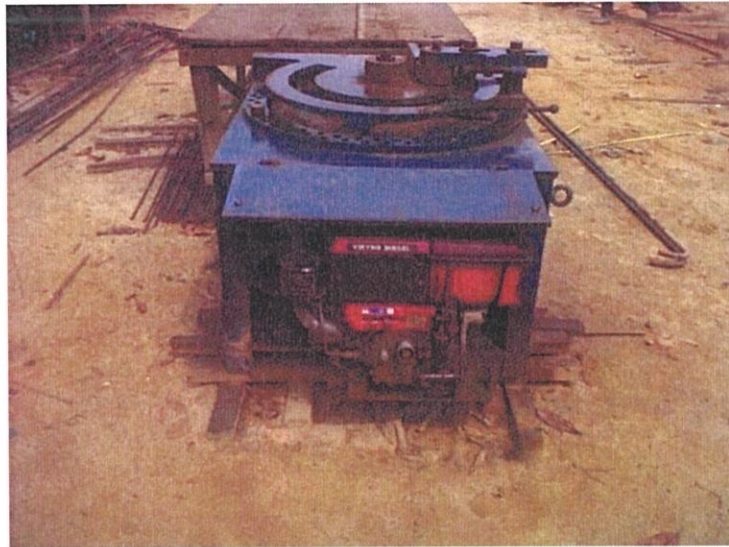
Bar bender machine that use to bend steel reinforcement
